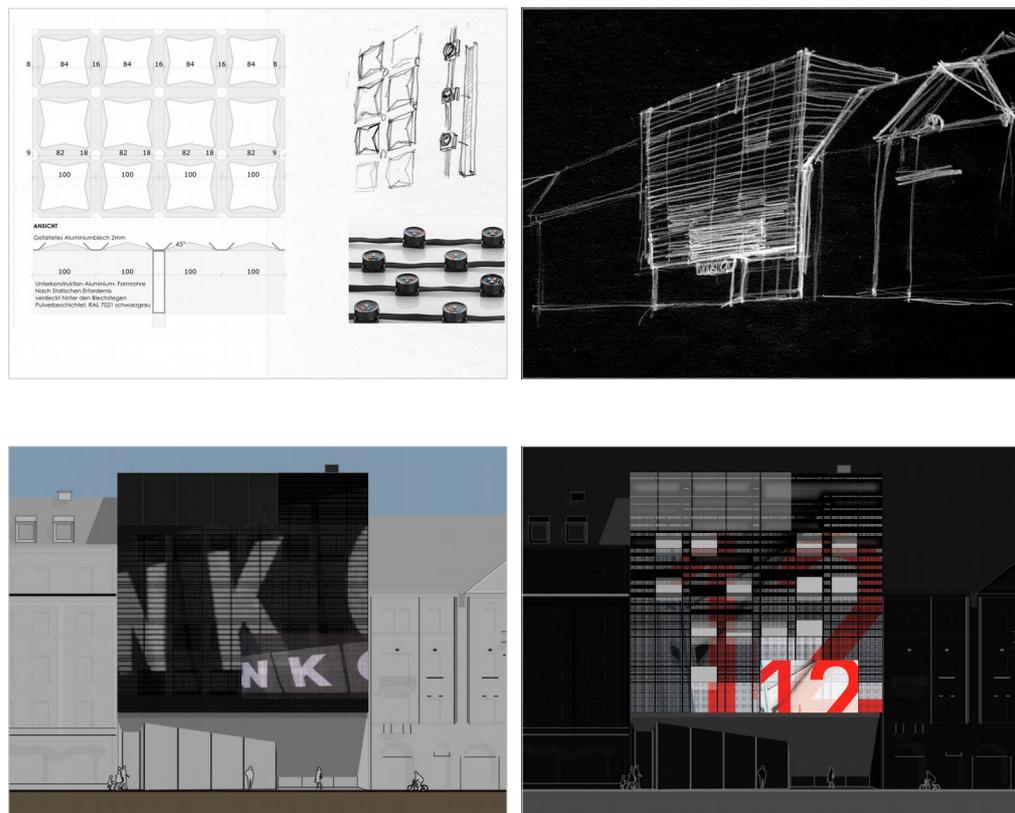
Innsbruck workshop: Initial sketches and visualisations based on structural façade cladding and resulting pixel pitch. © artXmedia and author.
